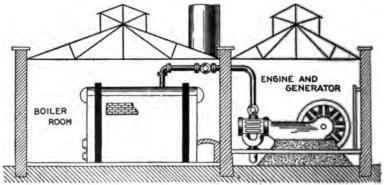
Elevation of small station with direct drive, showing arrangement of the bolls and engine, piping, etc.
